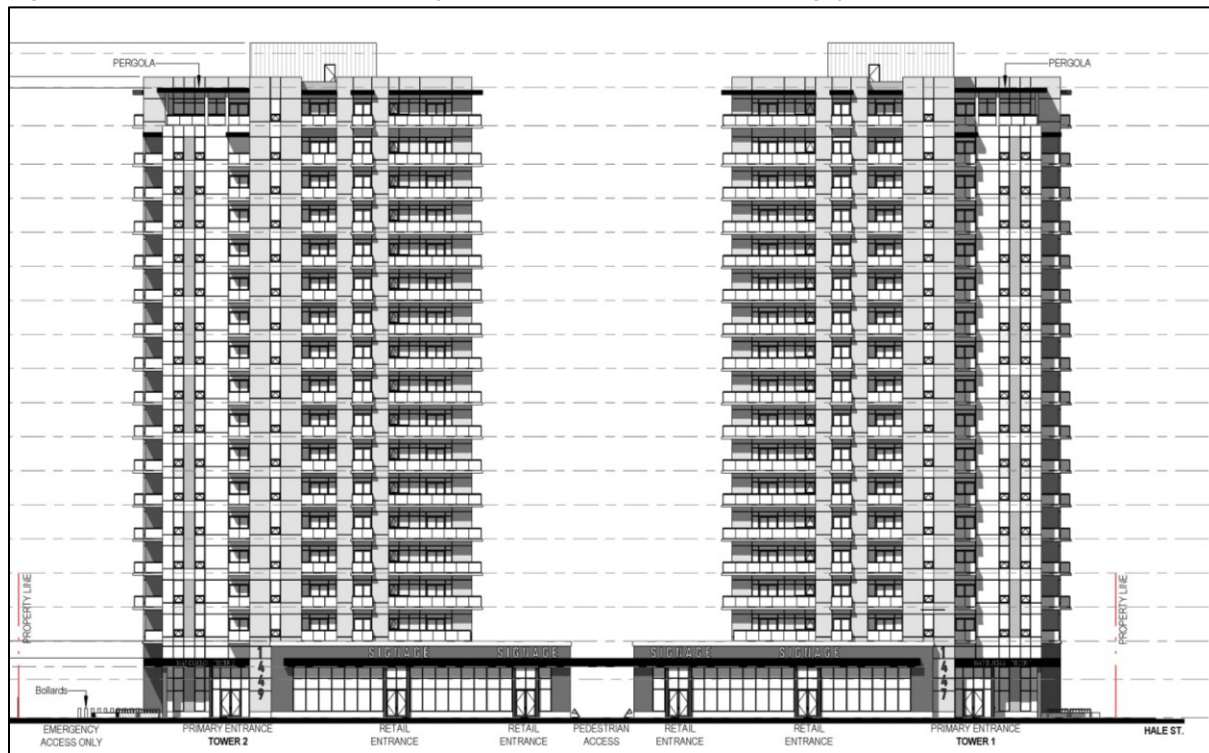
Proposed West Side Elevation (Interior side yard, facing a commercial lot)
